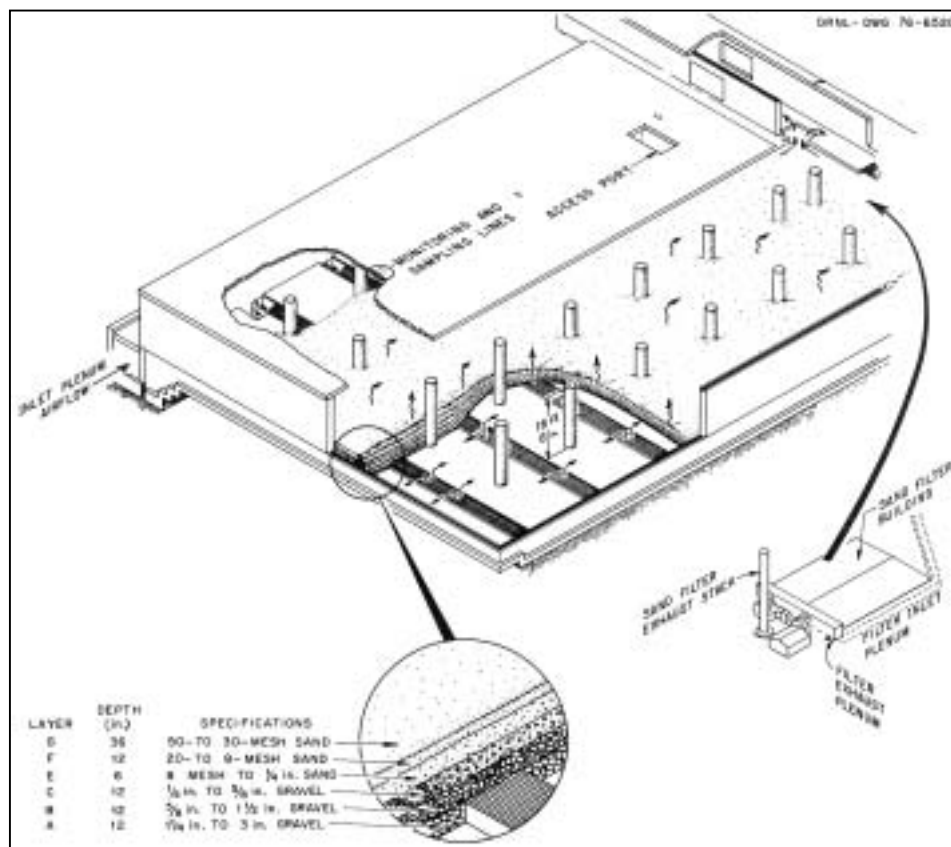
Overall Isometric View and Details of New Sand Filter at Savannah River Laboratory
